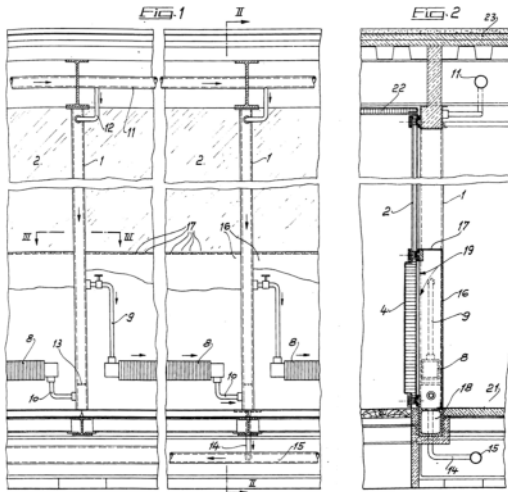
Patent drawing Nr. 1 784 864 of the operating principle of the pavilion prototype: Fig. 1 elevation detail from inside. Fig. 2: section detail of external wall. (Gartner 1968)
